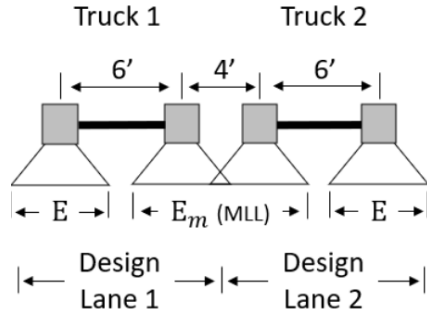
Illustration. Wheel spacing used for effective width calculation of bridge under MLL (E_m).
